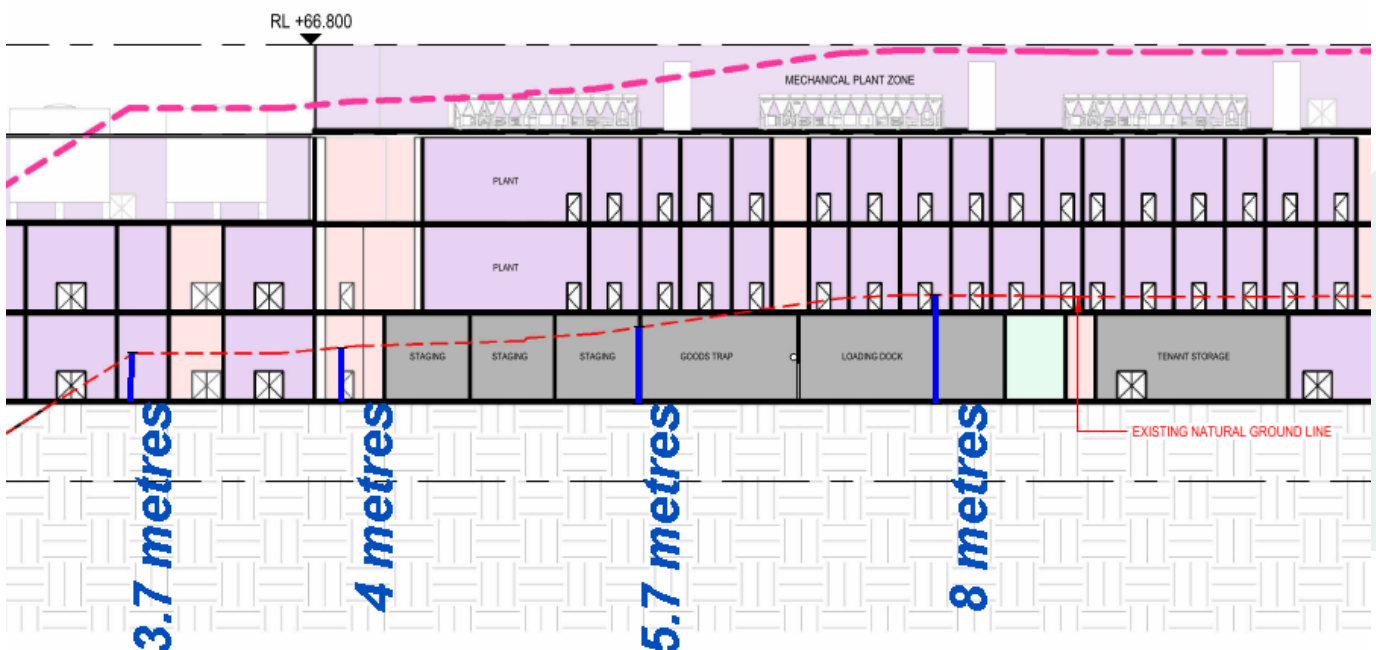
Section through the site with existing ground level in dashed red and levels of excavation depicted in blue (Source: Architectural Plans)
